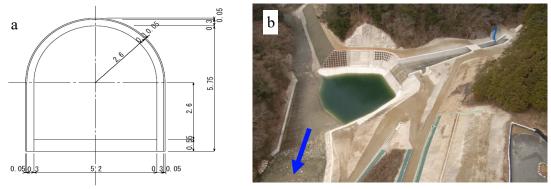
a) Typical cross section of the tunnel and b) discharge channel
